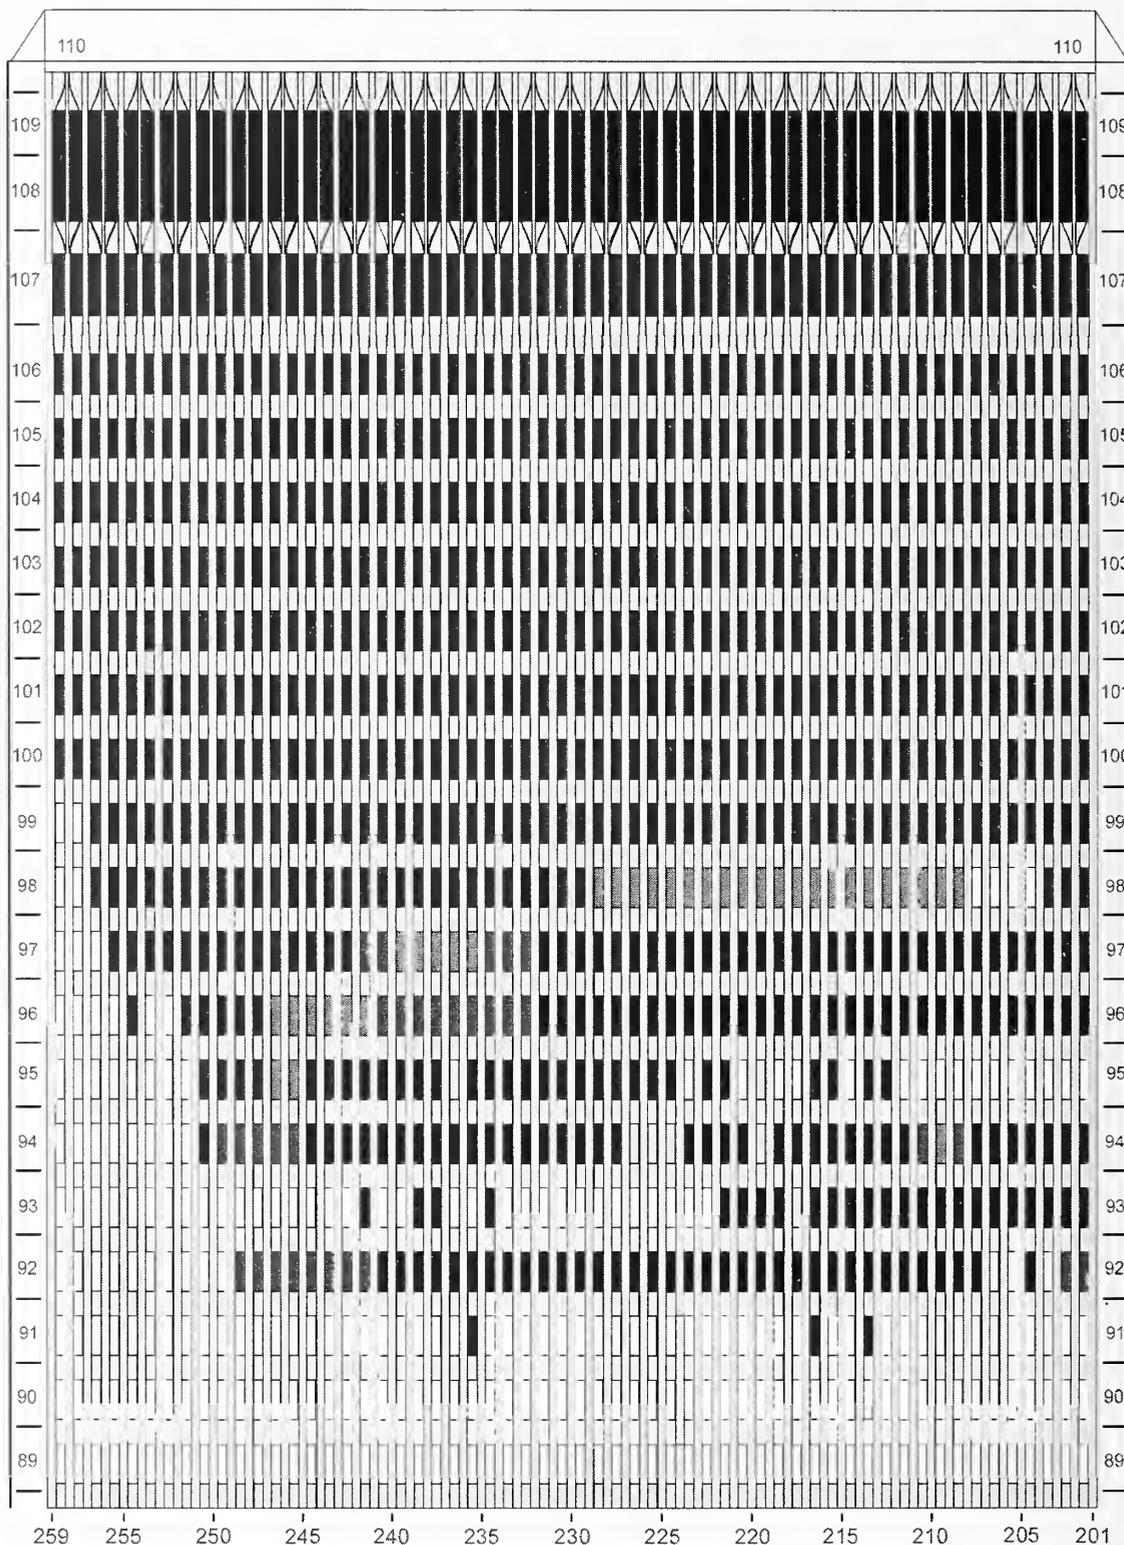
An example of a façade drawing combining data for window condition and fires is shown. The data is for the east face of WTC 1 around 9:50 a.m.
